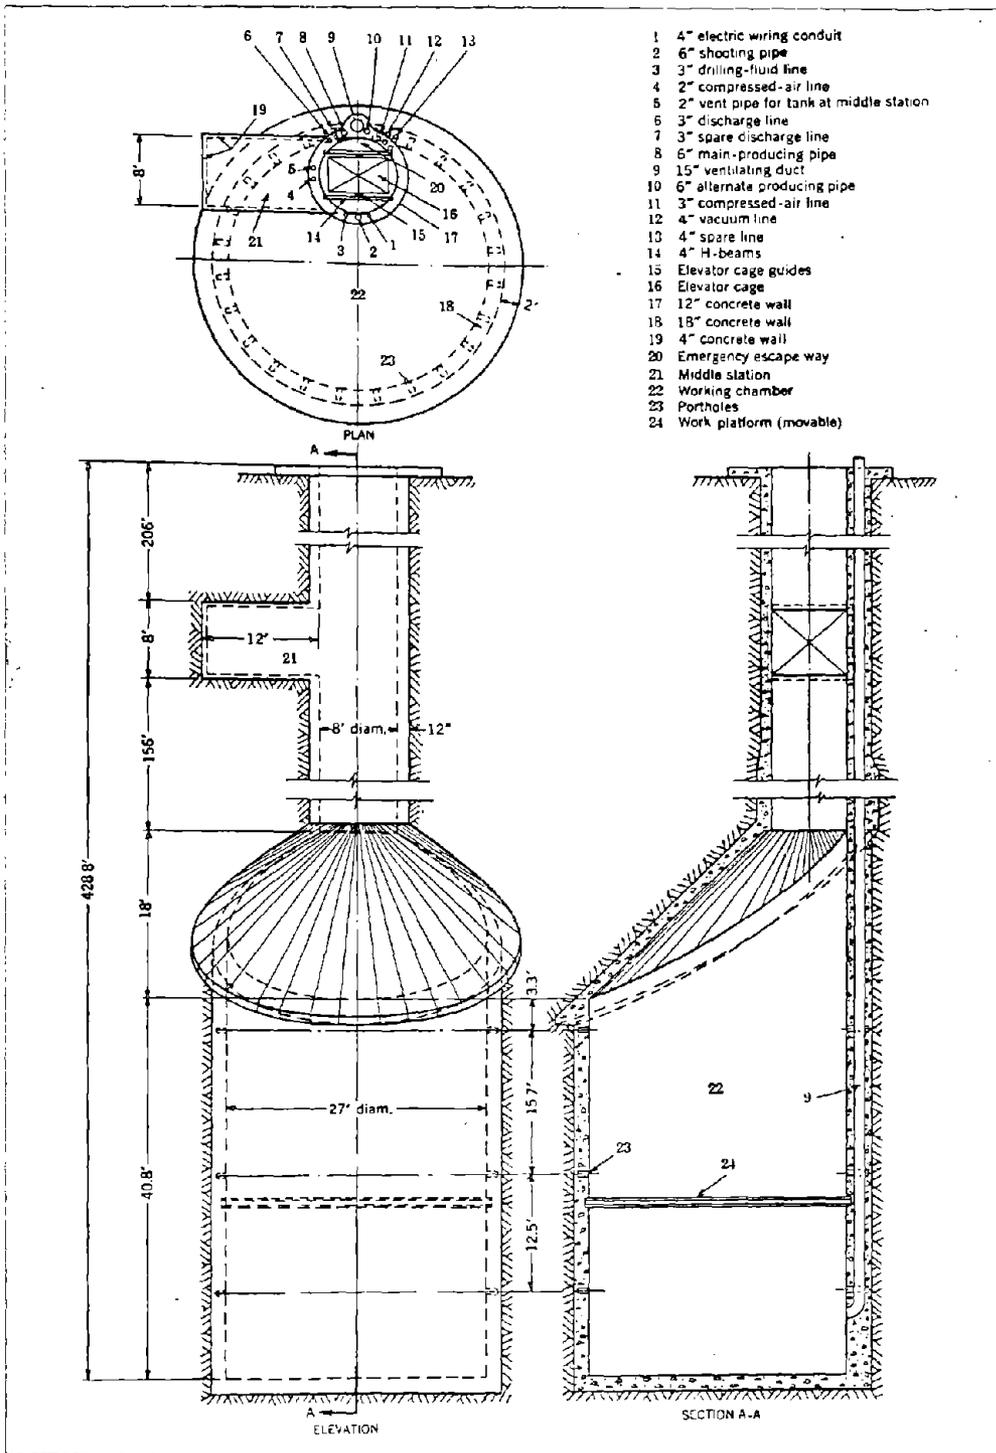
Plan, elevation and section view of shaft and chambers of the Venango Development Corp.'s horizontal oil-well drilling project, Franklin, Pa. (USBM R.I. 3779).
